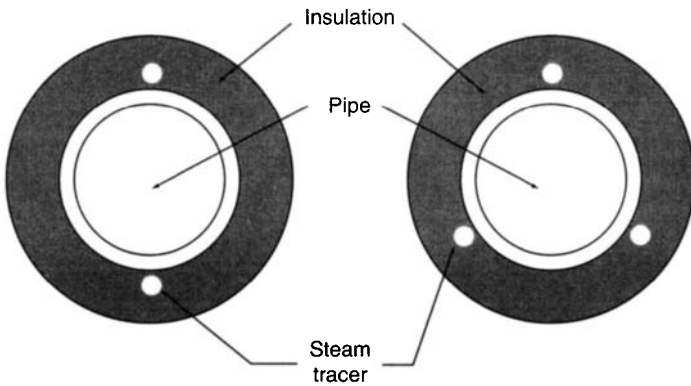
Typical installation of steam tracing lines for vertical piping.
